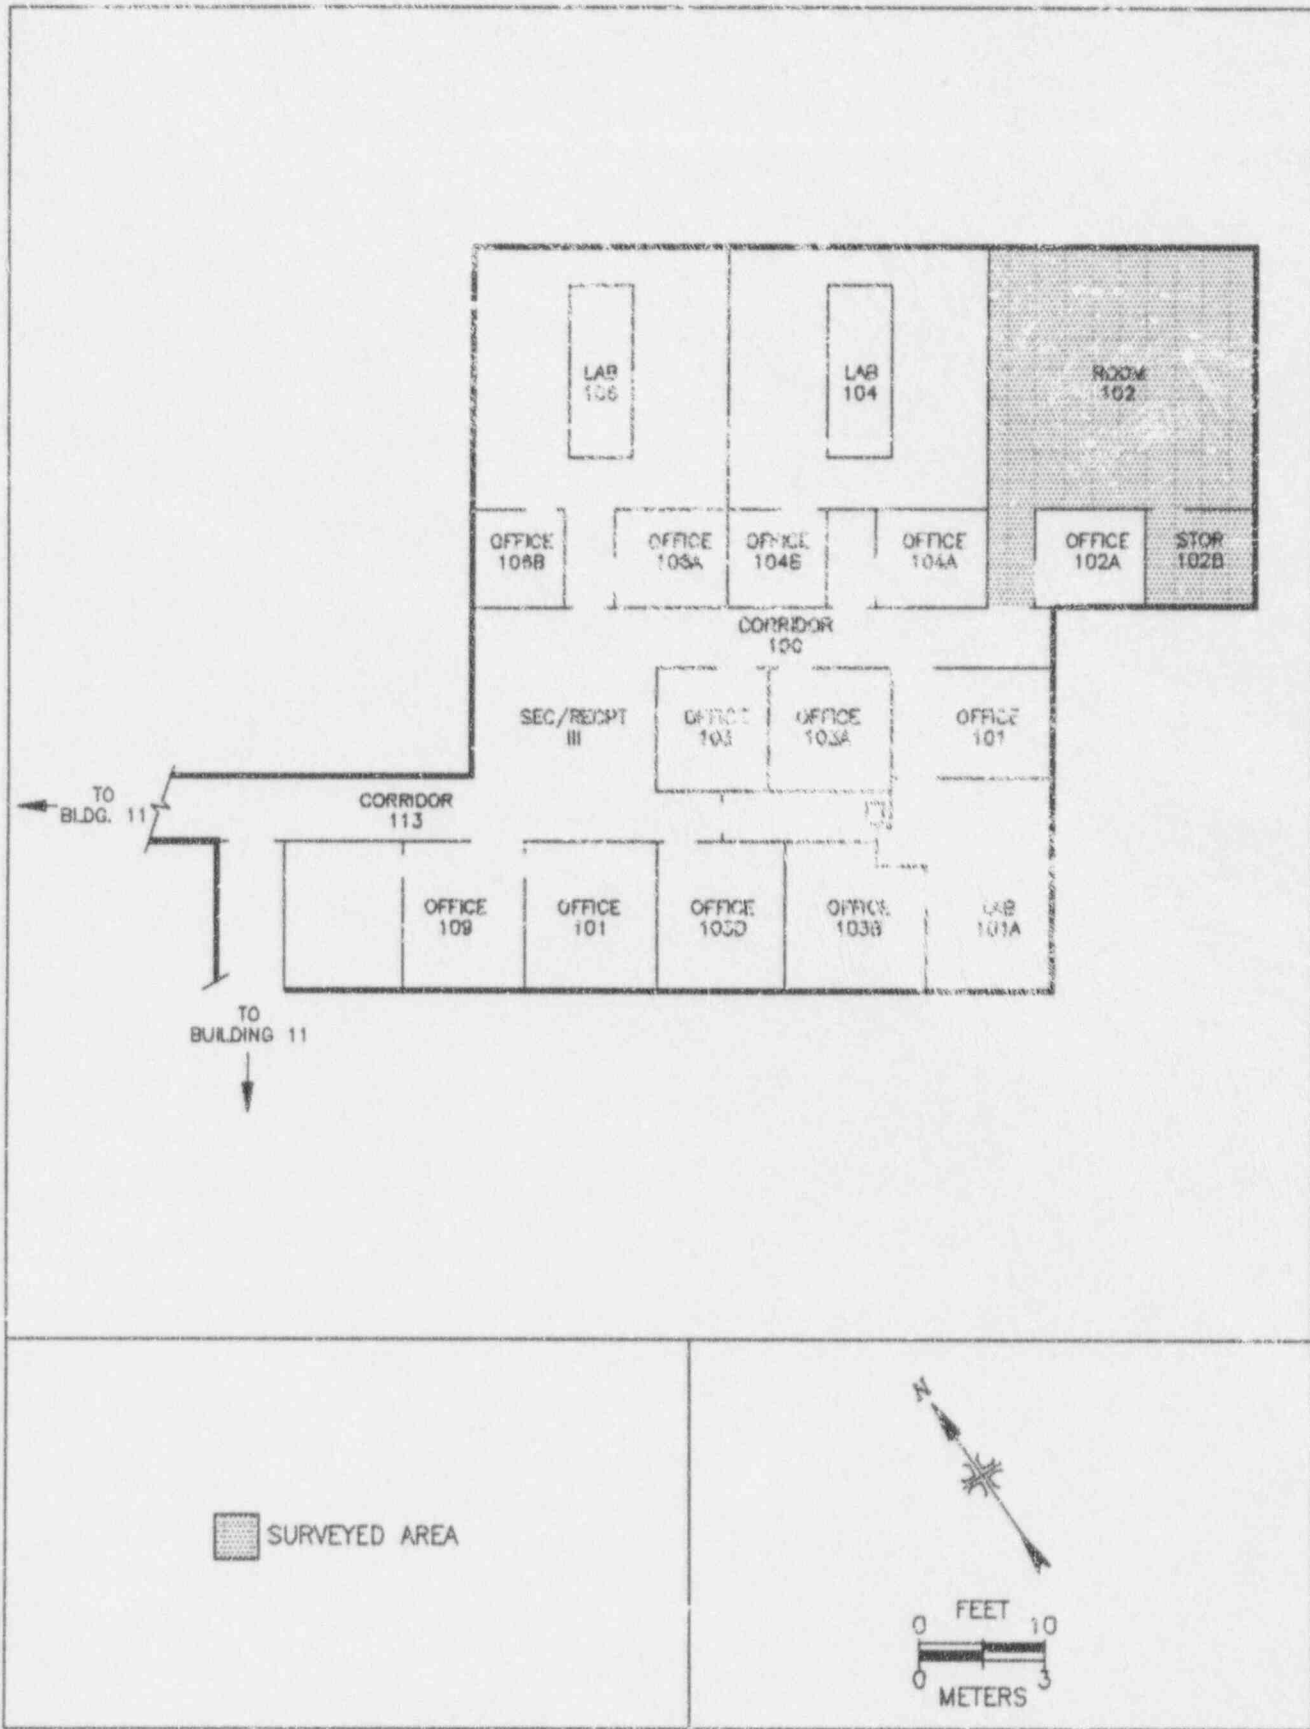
First Floor Plan of Building 19, Seattle VA Medical Center, Seattle, Washington
